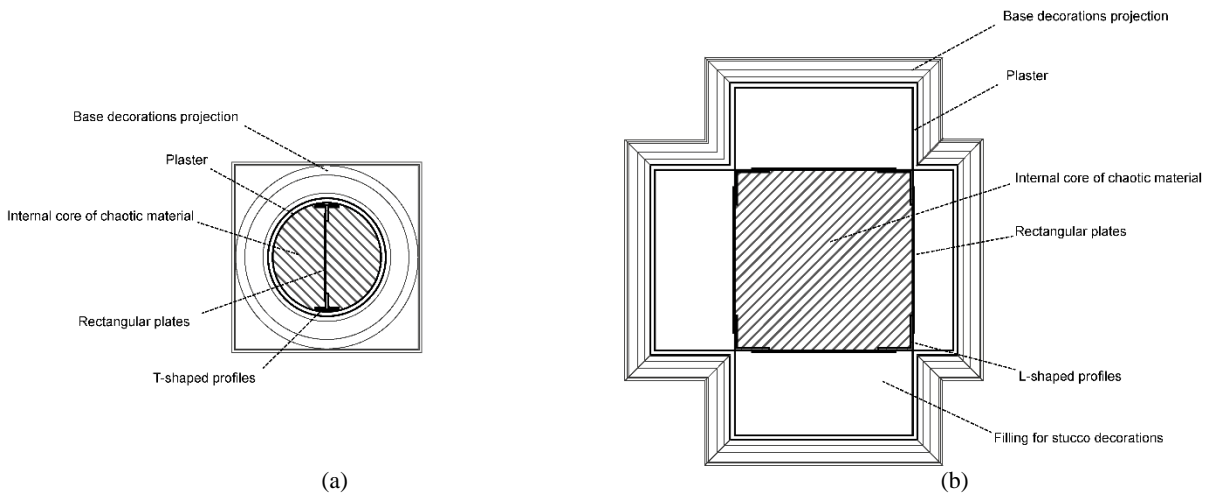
Structural section of the columns (a) and the piers (b) of the church
